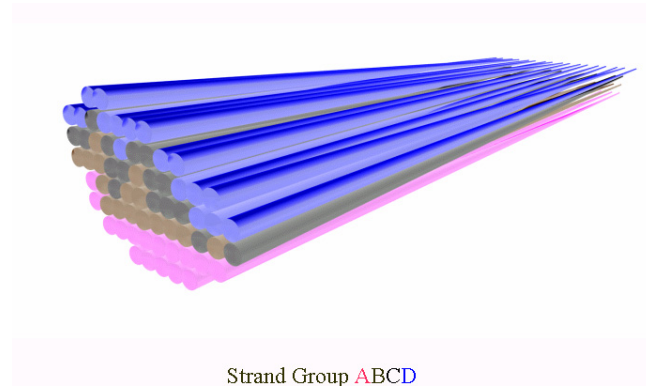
Schematic Cable Strand Layout at the East Anchorage
